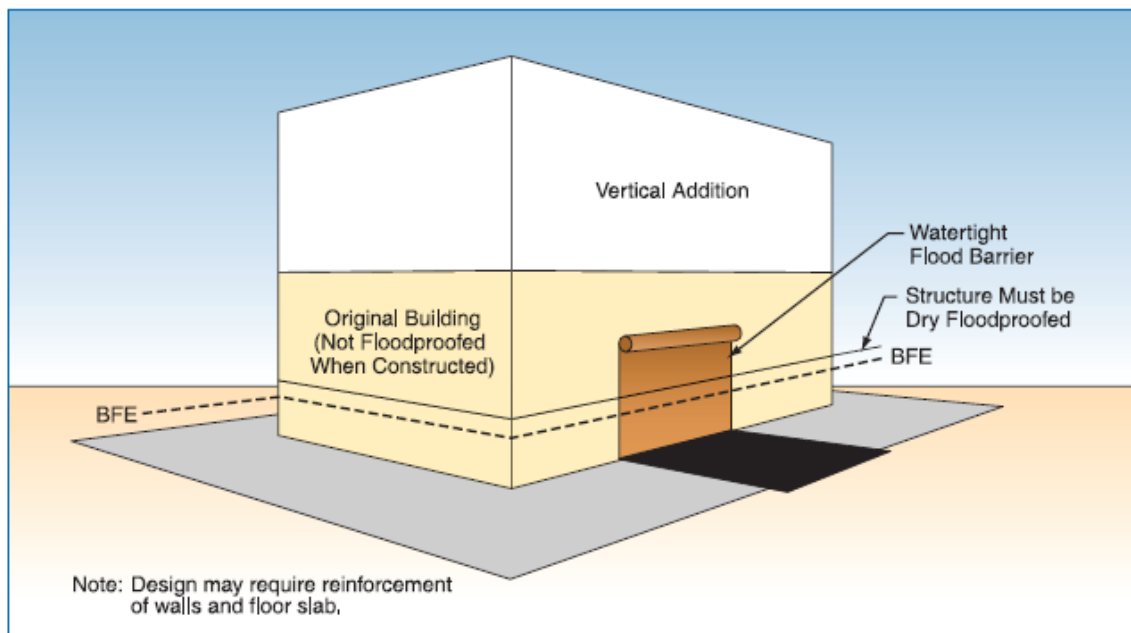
Vertical addition to a pre-FIRM, non-residential building in an A zone. The work constitutes a substantial improvement. The building is brought into compliance by retrofit dry-floodproofing measures (certification of design by registered design professional is required). Non-residential buildings can also be brought into compliance by elevation (not shown).
